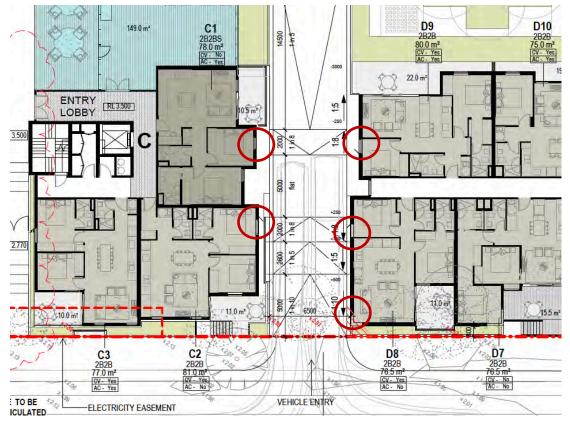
Ground Level Plan extract highlighting windows within 1 metre of the basement ramp. From Drawing TP01.04
